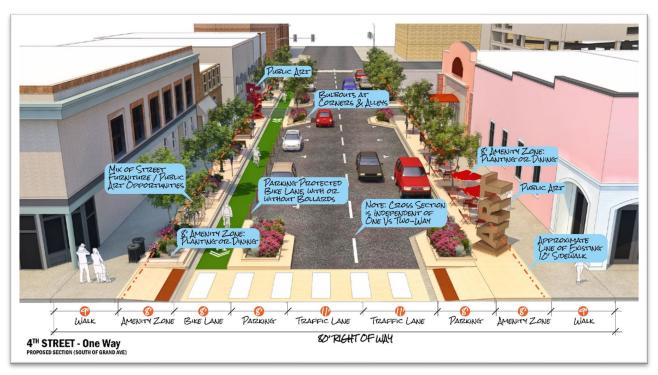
Proposed Section - One-Way - 4th St South of Grand Ave
